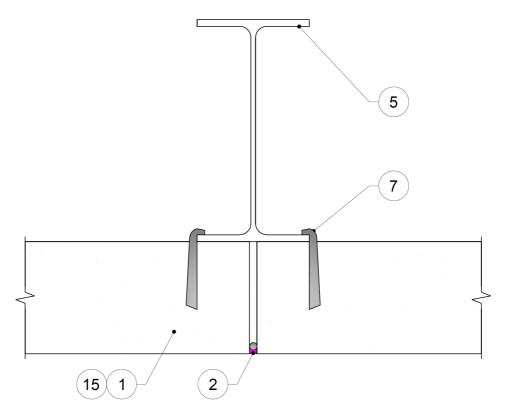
Plan Section at Vertical Steel Column – Hebel Ties
